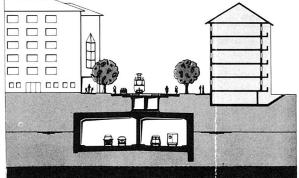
Tunnel 'Horburg West': Typical Cross Section
